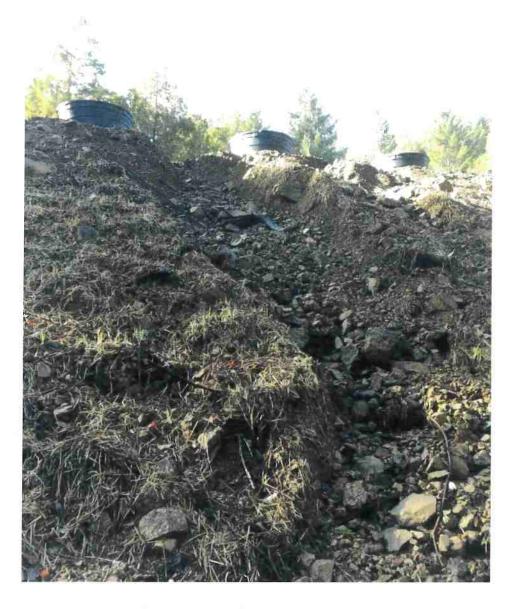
Erosion of fill slope of outdoor cultivation pad (Map Point B). Photo date 1-24-17
